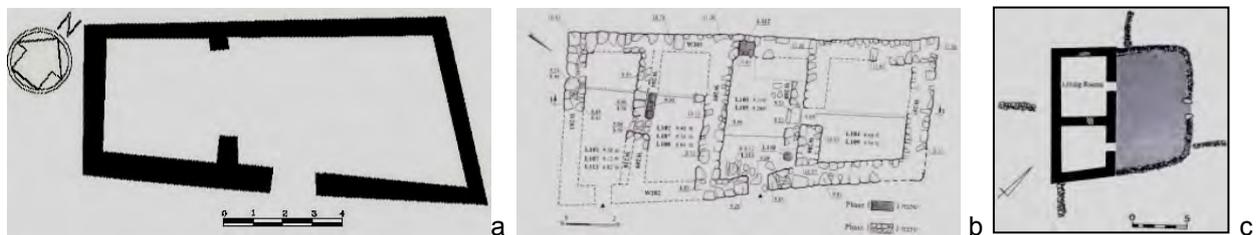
(a) plan of house no. (6) at al-Hallabat,(b) plan of building at Ein 'Aneva (After Magness, 2004) (c) plan of a simple farmhouse at Nahal ha-'Etz (Source: After Hirschfeld, 1995: 38, Fig.14).
